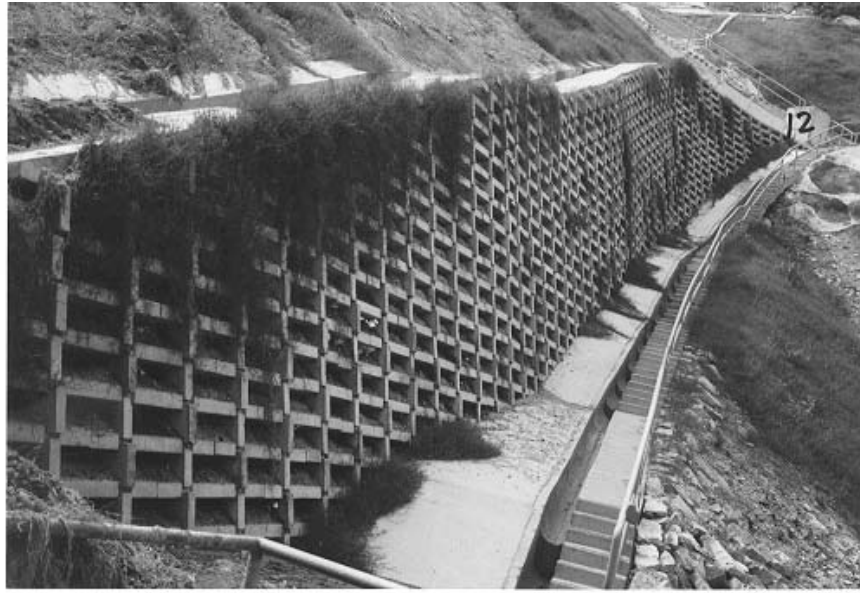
Event No. 2: 24 May 1998. View North Along Crib Wall at Toe of Slope A. Note Lack of Debris Over-spill at Toe of Wall and Loss of Fine Material (Topsoil) From Wall Infill. (Photograph Taken on 28 May 1998)
